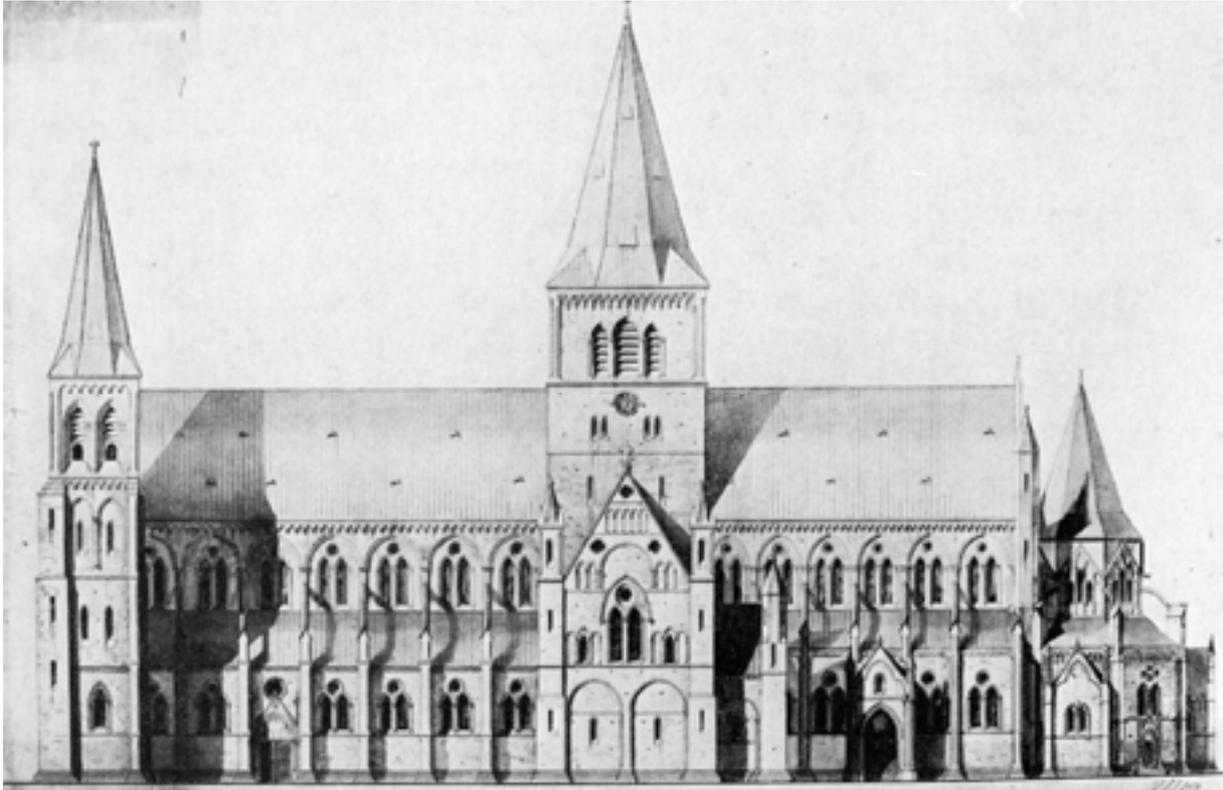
Architect Schirmer's 1851-reconstruction plan of the cathedral - a plan that was never executed. Note that parapets are omitted. Schirmer believed they would become a constant nuisance due to the harsh climate in Trondheim (ARW, no. 57h).
